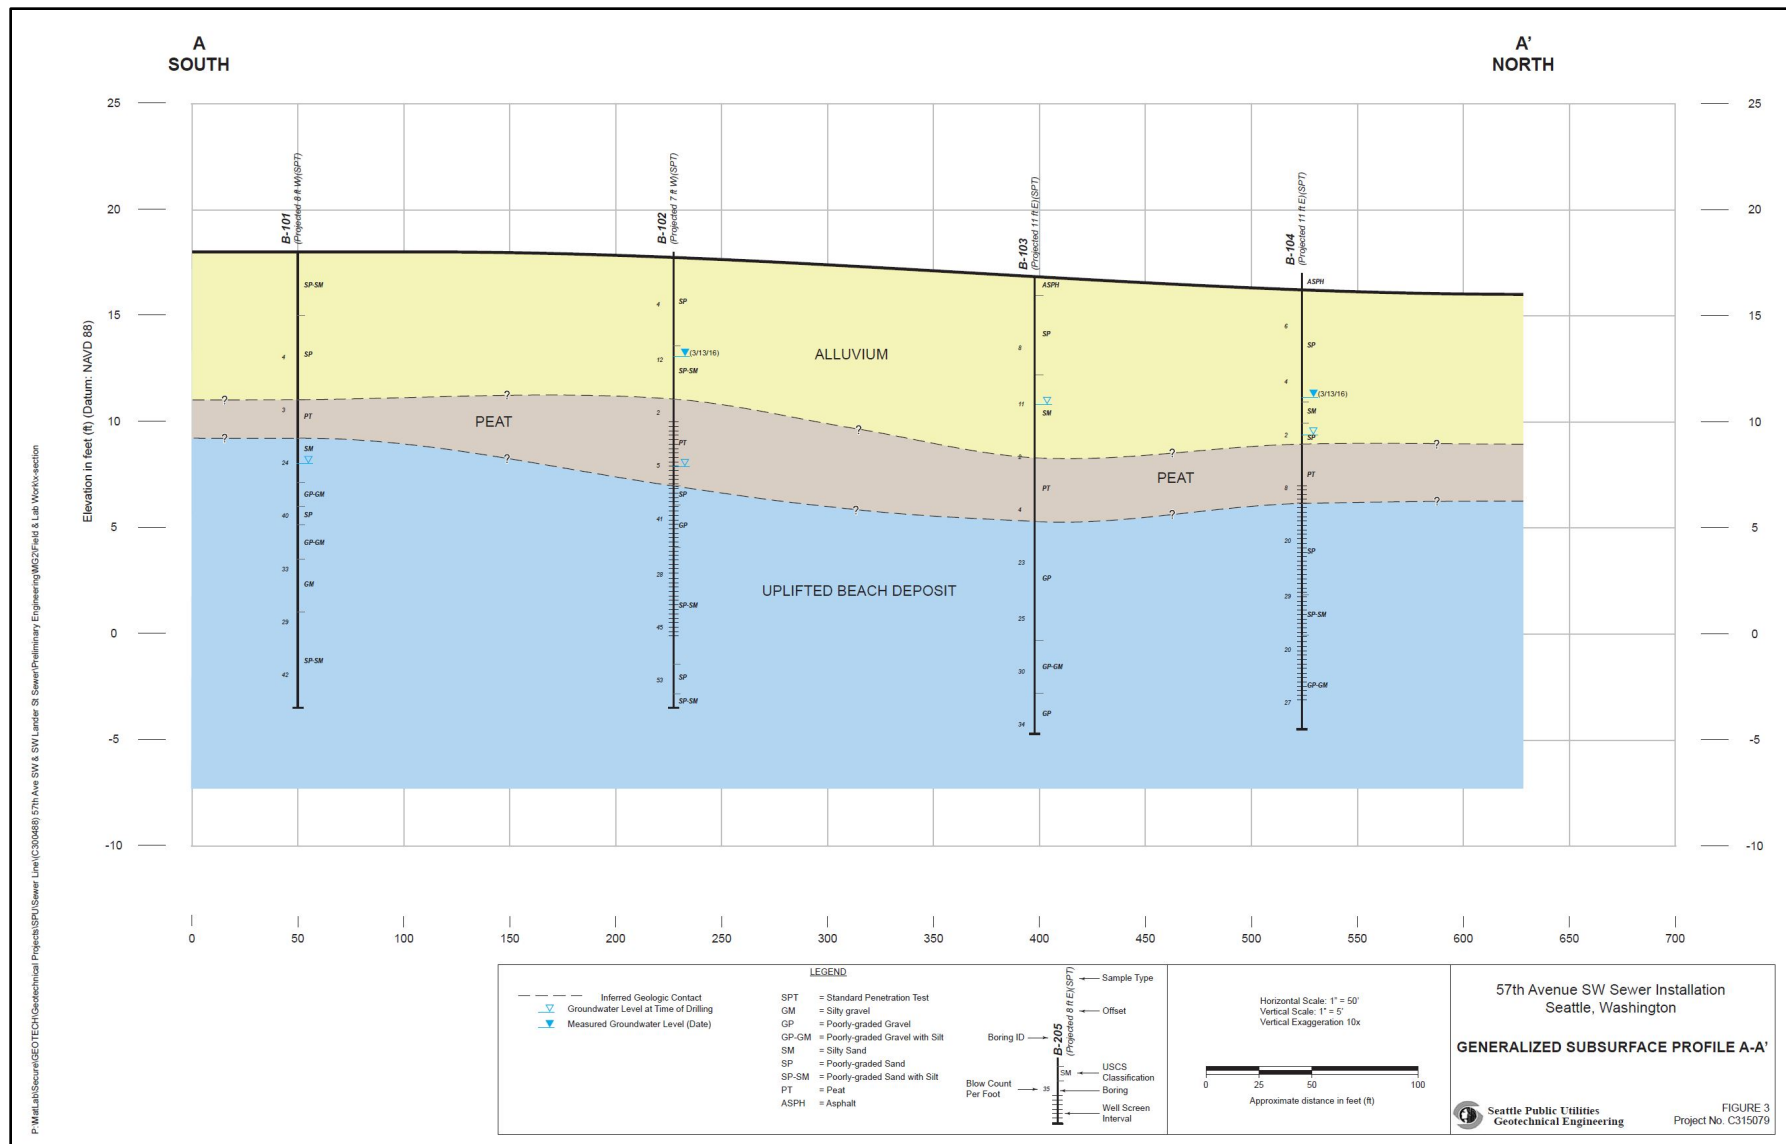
Cross-section showing borings B-101-B-104 from SPU (2016) sewer installation project for the 57<sup>th</sup> Ave site.
